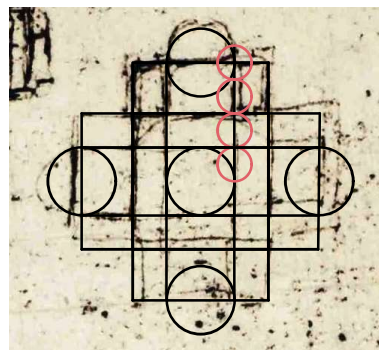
Deconstruction of the plan depicted in C.A., f. 362 b-r.
